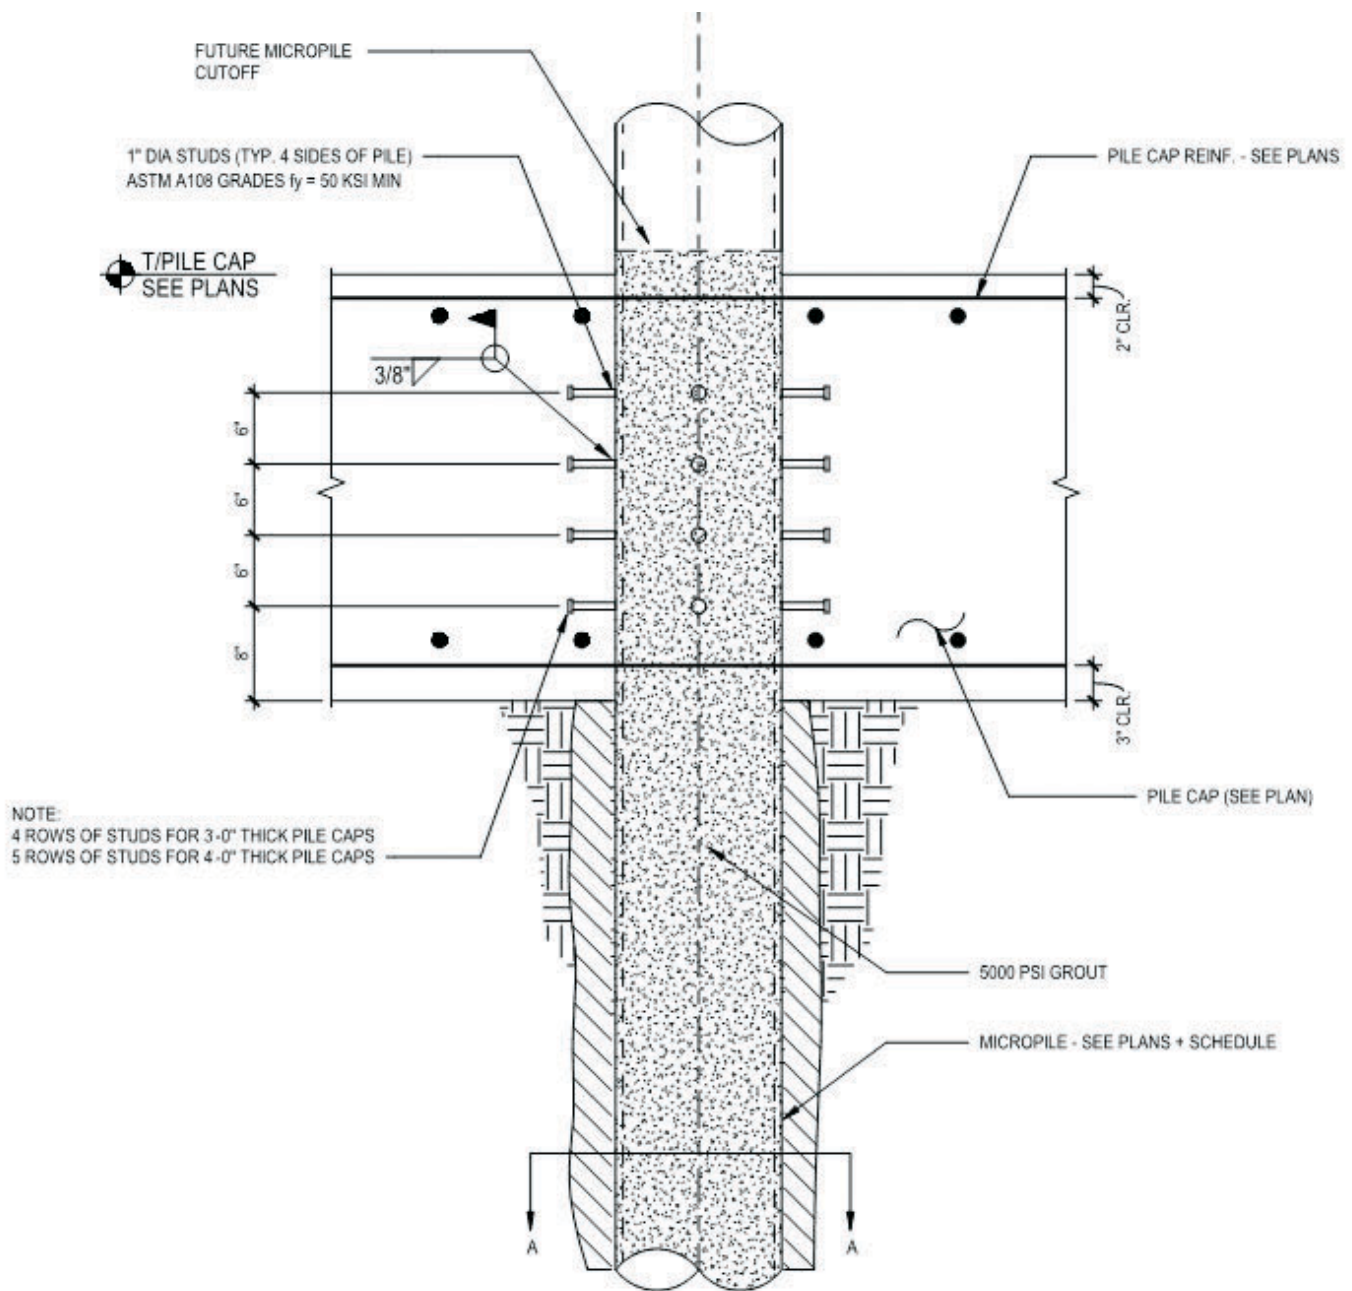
DETAIL OF SHEAR CONNECTORS IN NEW PILE CAPS AND NEW BEARING WALL CONSTRUCTION
